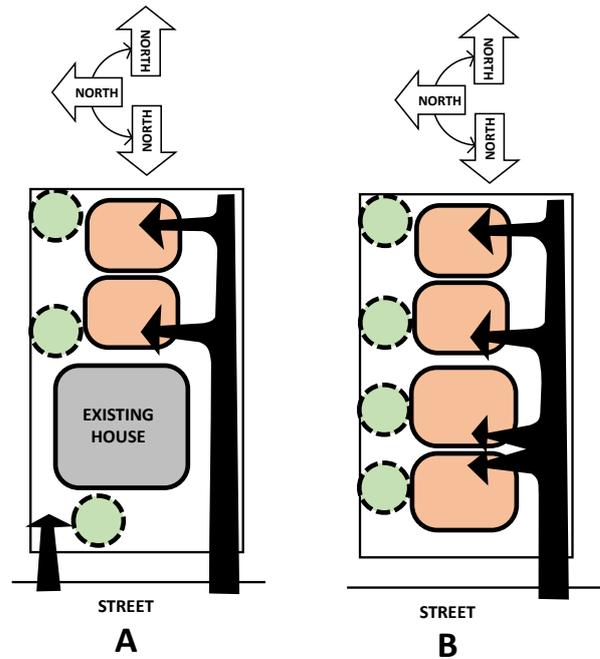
Possible ways to organise dwellings and private open spaces on a site.
